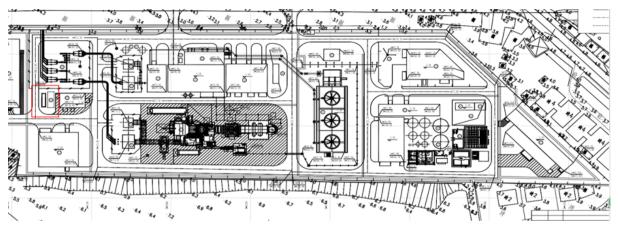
Location of Sanitary Wastewater Treatment System in Project Layout Plan
